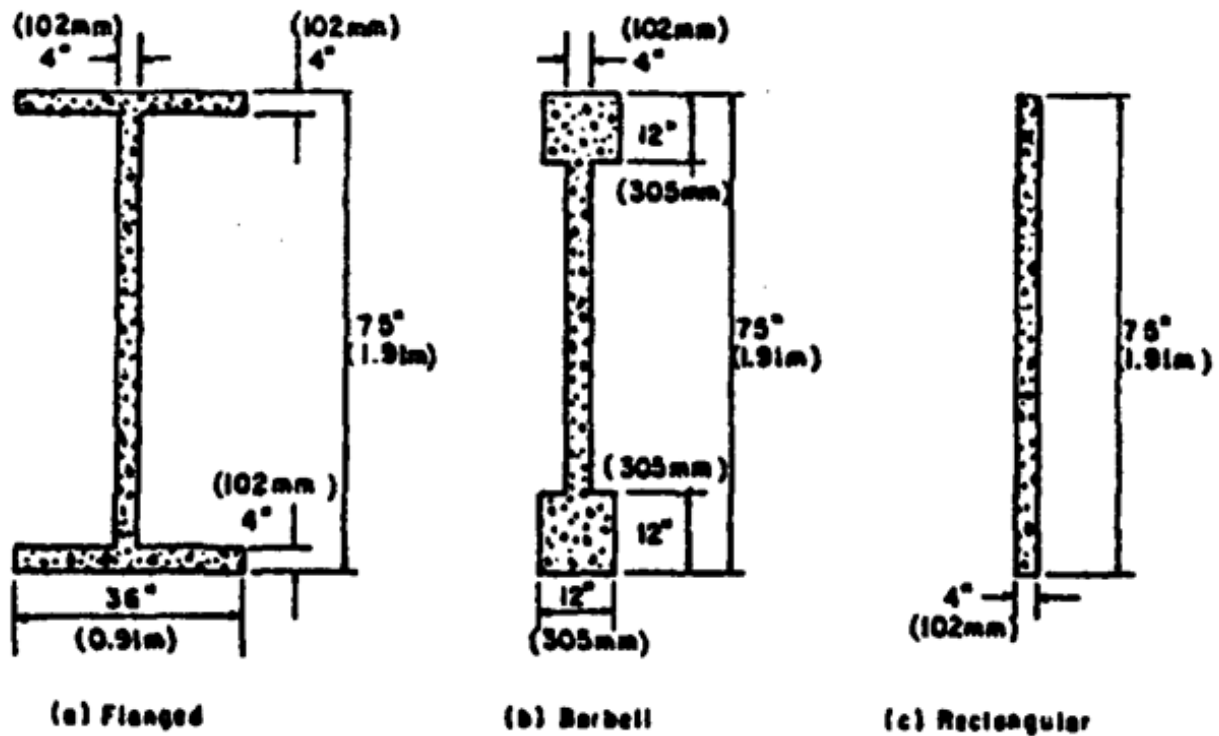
Wall sections tested by Oesterle et al. (1979).
